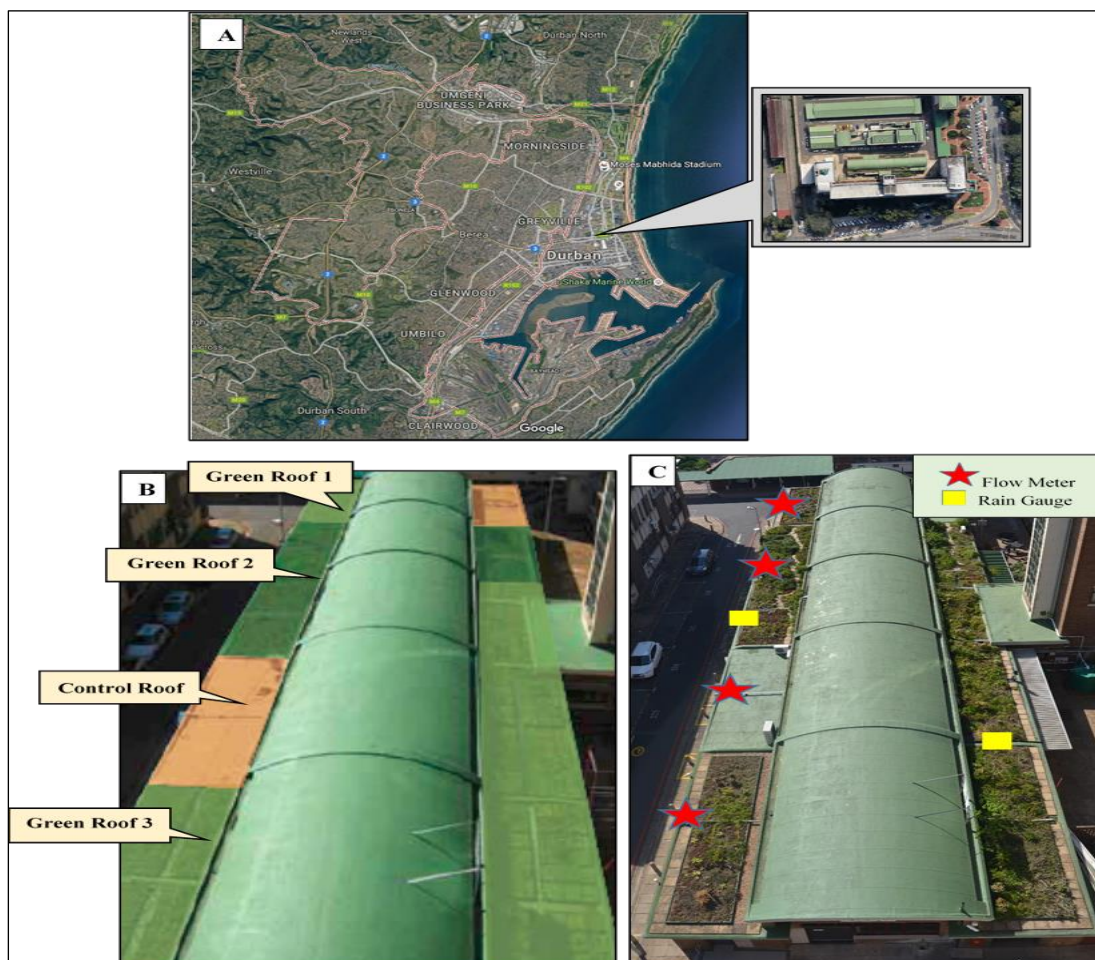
Study area and site: (A) location of the Green Roof Pilot Project in relation to Durban, (B) plan view indicating initial demarcated roof areas, and (C) location of green roof monitoring apparatus on the Green Roof Pilot Project
